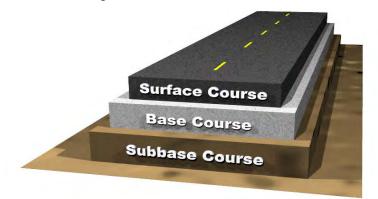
TYPICAL FLEXIBLE PAVEMENT CROSS SECTION
